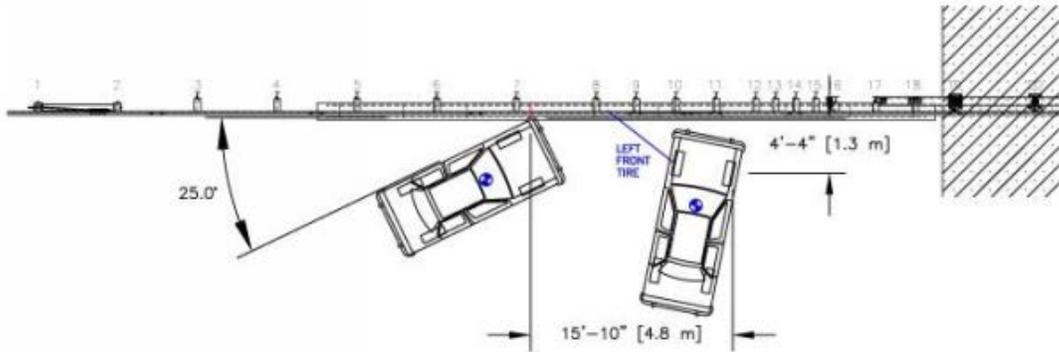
Test Impact Drawings for Test No. MWTC-1.
